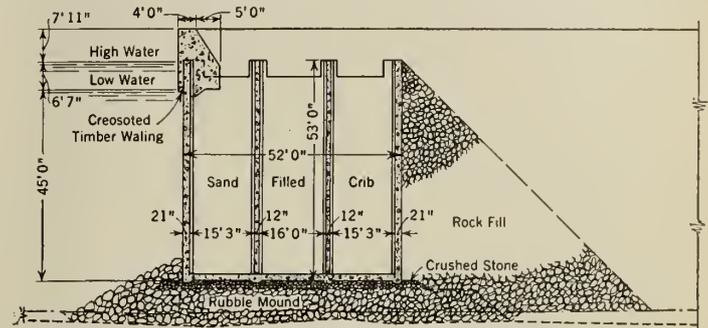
Section of Dock Wall, Pier B, Halifax.
